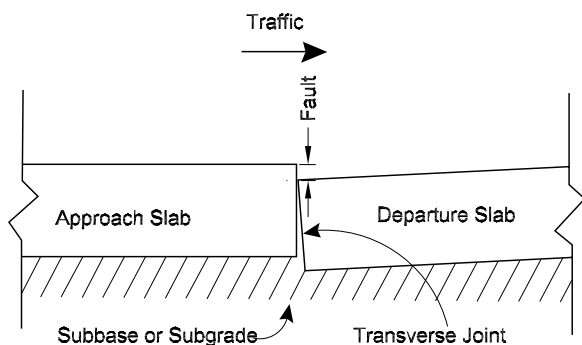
View of Longitudinal Section of Faulting at a Transverse Joint or Crack
